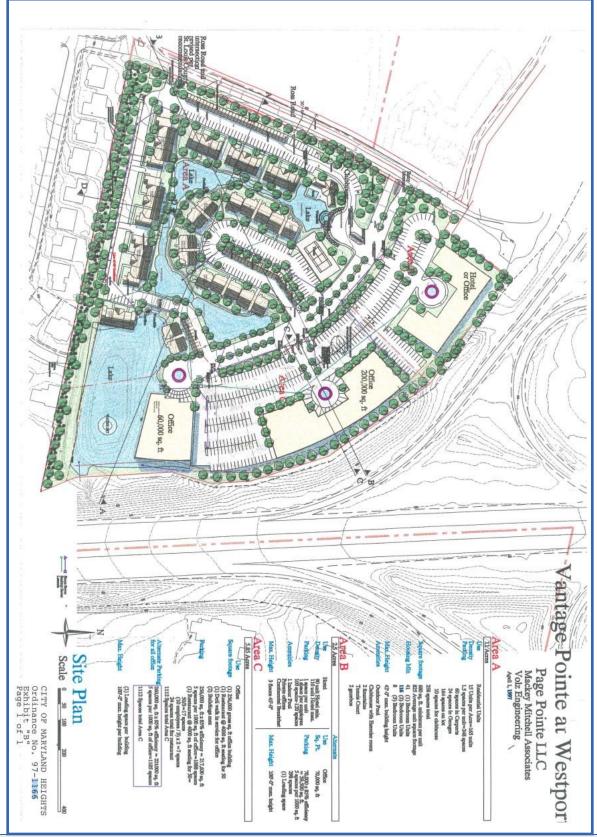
EXHIBIT F: SITE PLAN OF PREVIOUSLY APPROVED OFFICE BUILDINGS (ORD. 97-1166)
